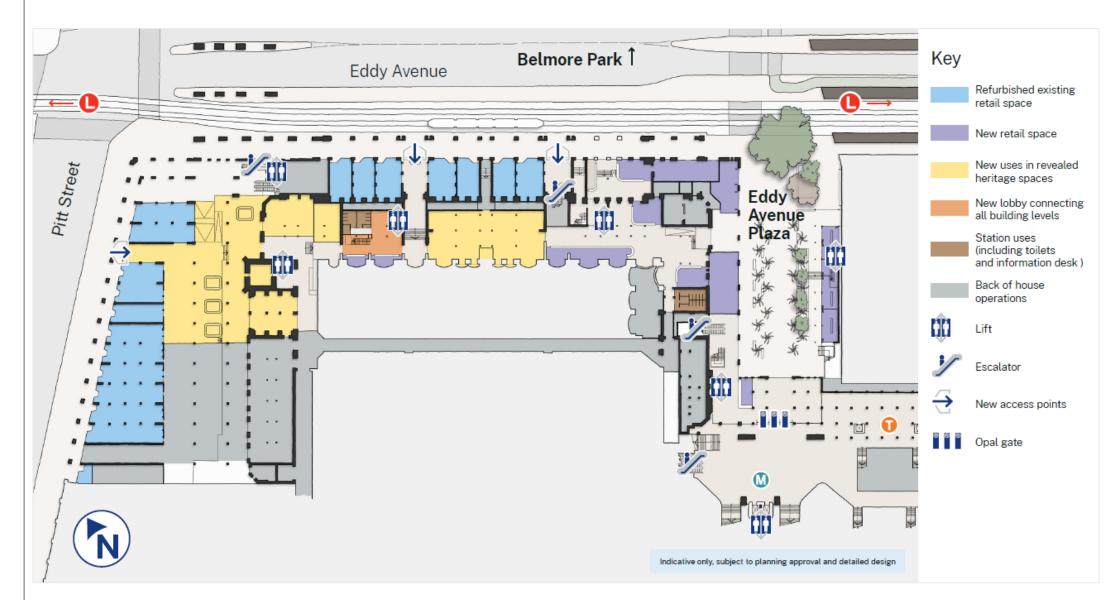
Proposed uses within the Sydney Terminal Building – Street level
